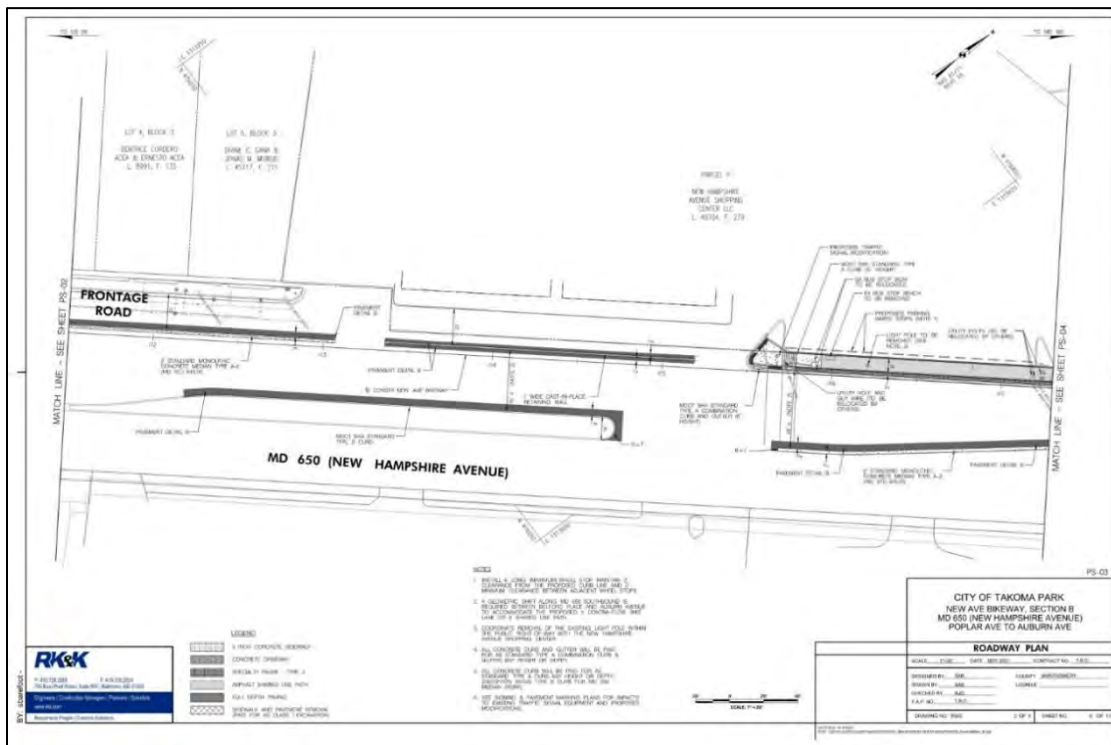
Plan View of Proposed New Avenue Section B Improvements (Part 2)
